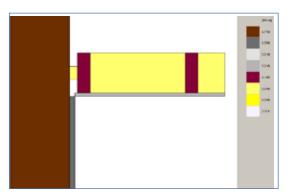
A wall-ceiling junction before any insulation improvement is made. The wall is shown on the left, with a layer of existing wet plaster on it. The ceiling above has quilt insulation between the joists. The joist nearest the wall will tend not to be flush against the wall and there will typically be a 30mm gap between the joist and the wall. In any case a minimum gap of 30mm should be maintained between the solid wall and the insulation to minimise risk of rain penetration.
